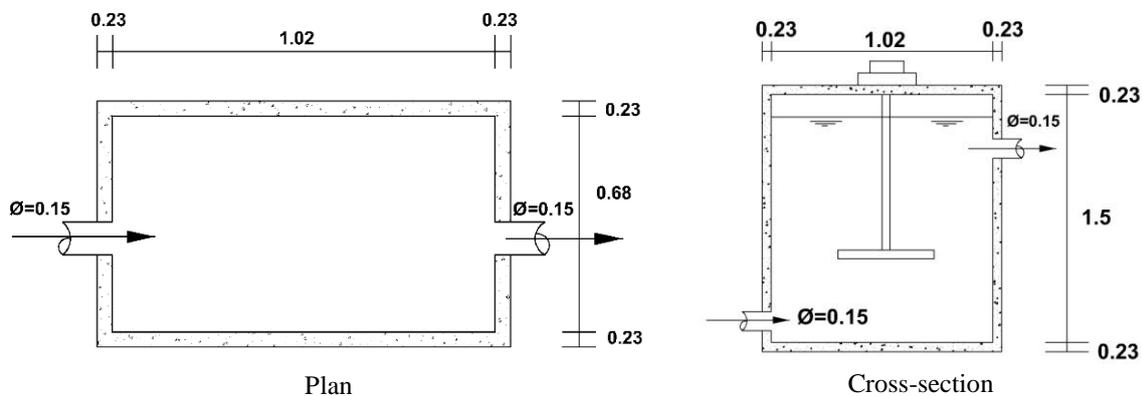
Plan and Cross-section of designed Disinfection Unit (dimensions in m, not up to the scale)
